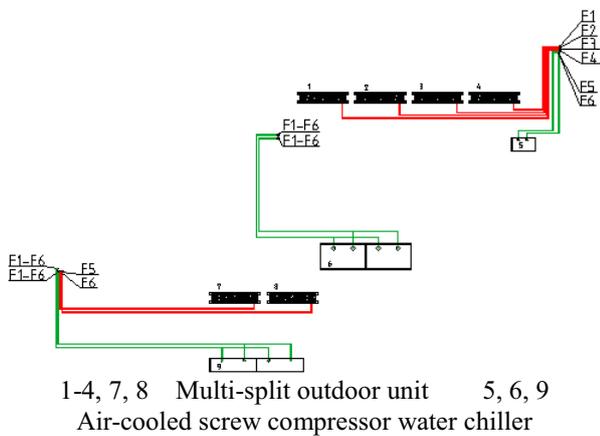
The conceptual drawing of outdoor units in the 6th floor roof
